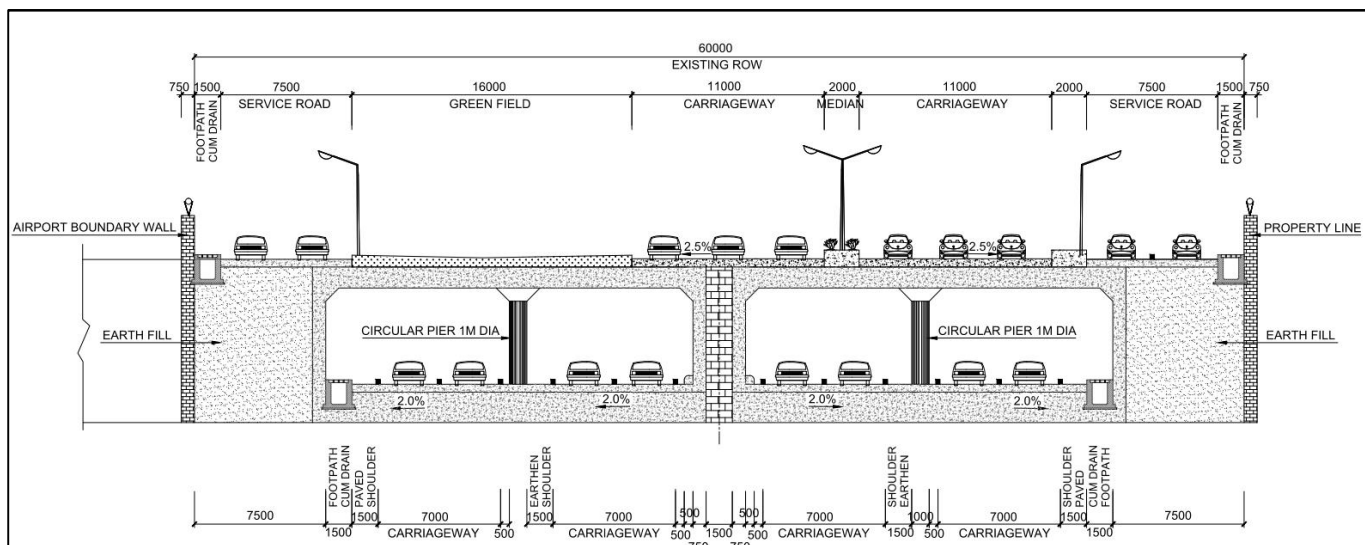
Typical Cross Section of Dwarka Expressway Underground Alignment Along Airport
